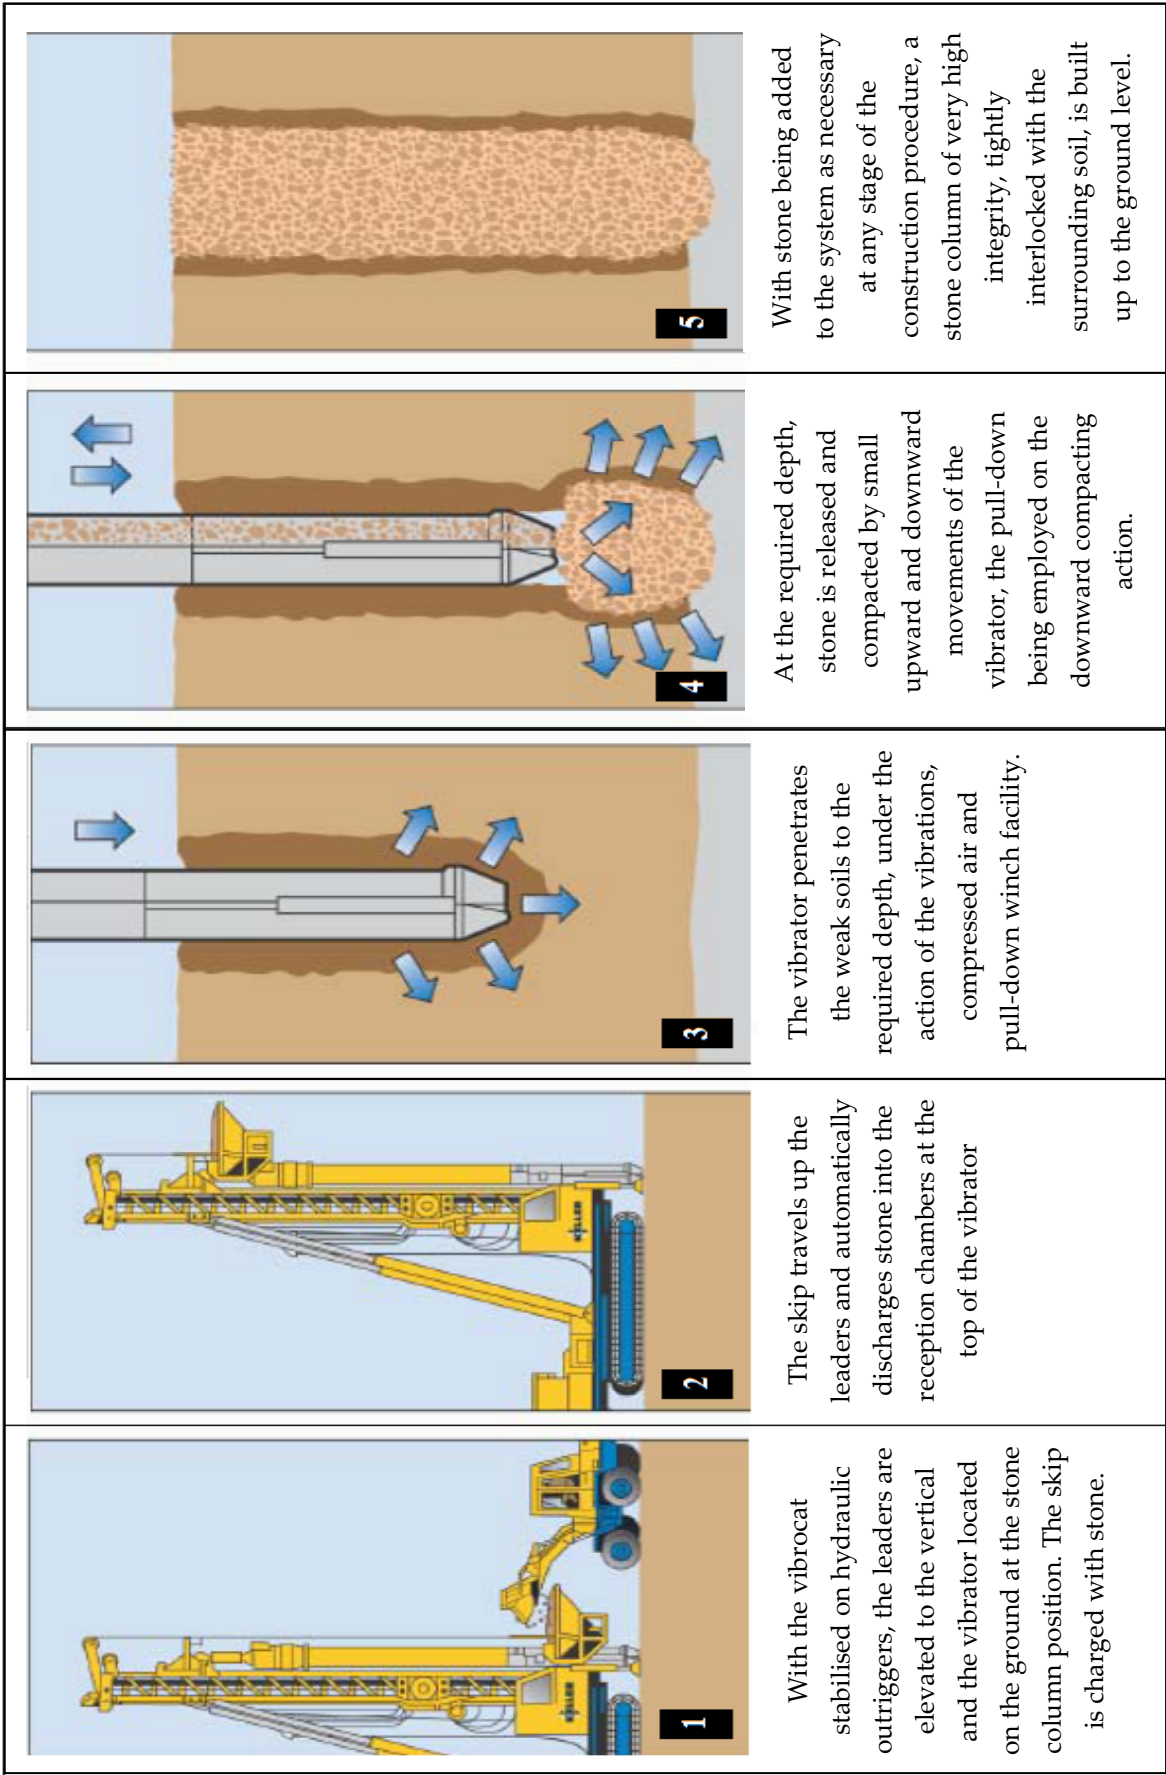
Bottom Feed Method of Stone Column Construction (McCabe, 2007)
